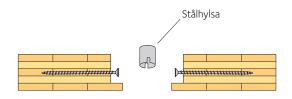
Joint with connecting steel sleeves and wood screws.
